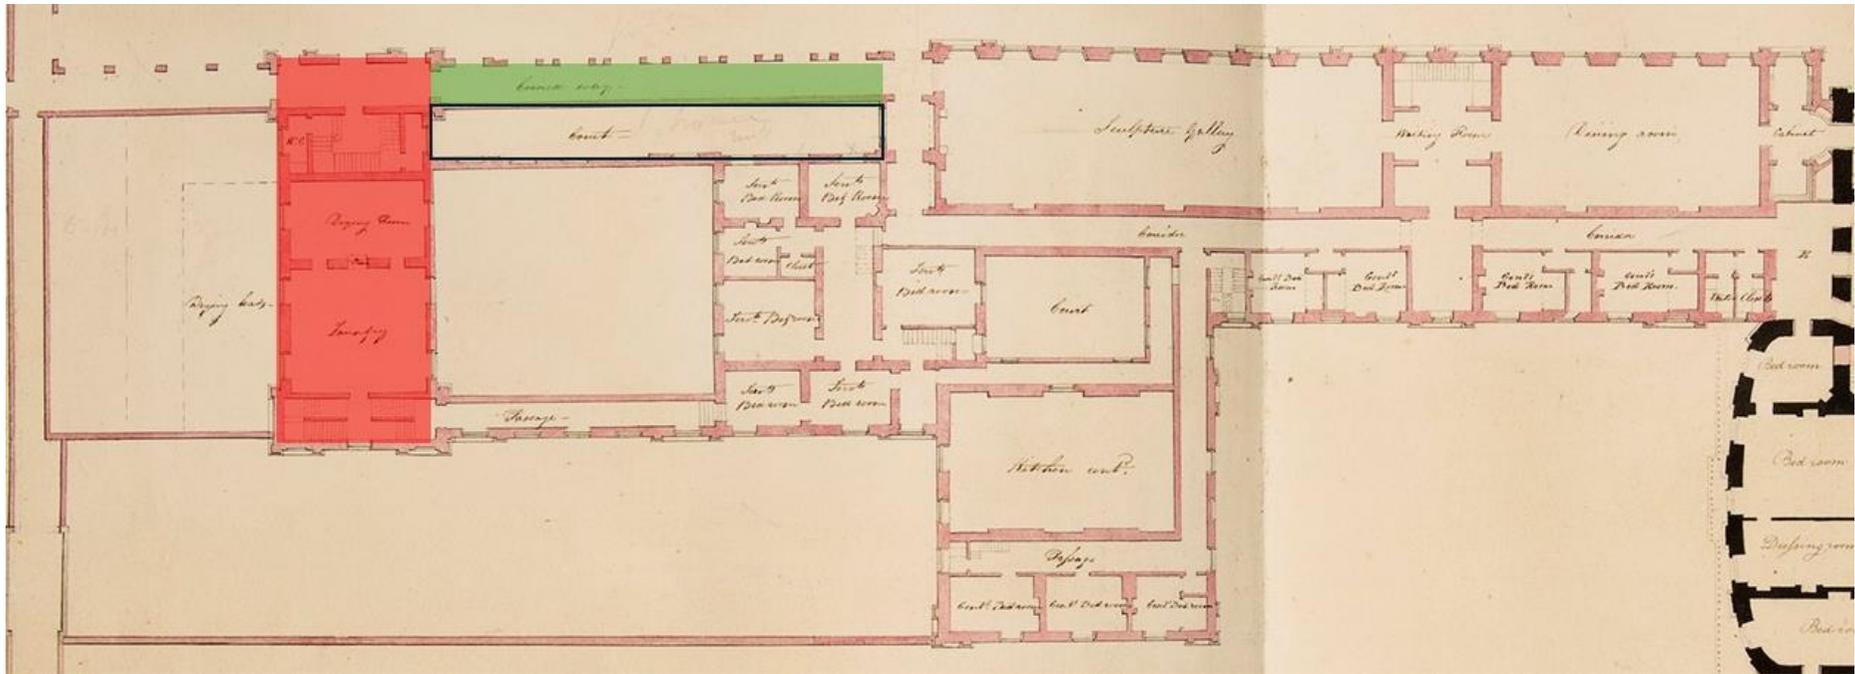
Detail from Wyatville's floor plan, titled 'Principal or Library Story'. The Banqueting Room building is highlighted in red; the covered way in green; the courtyard space is delineated in black. (WY/T/2, 5).
